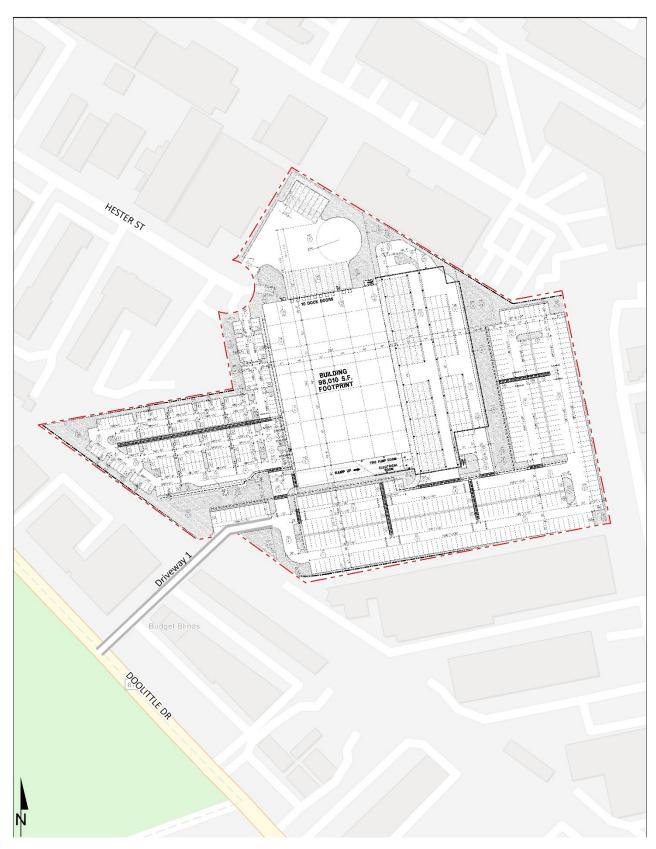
PRELIMINARY SITE PLAN
